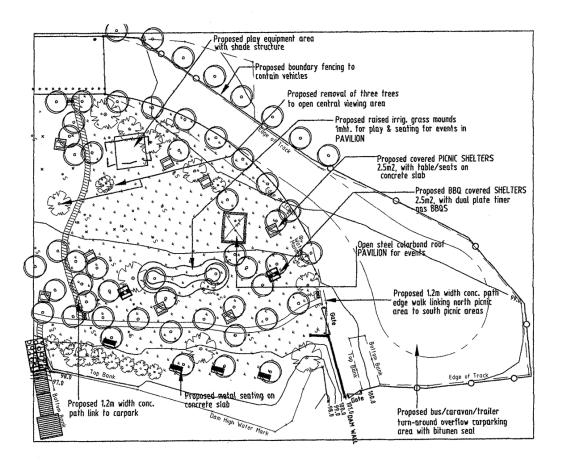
PLAN OF THE NORTH PICNIC AREA
